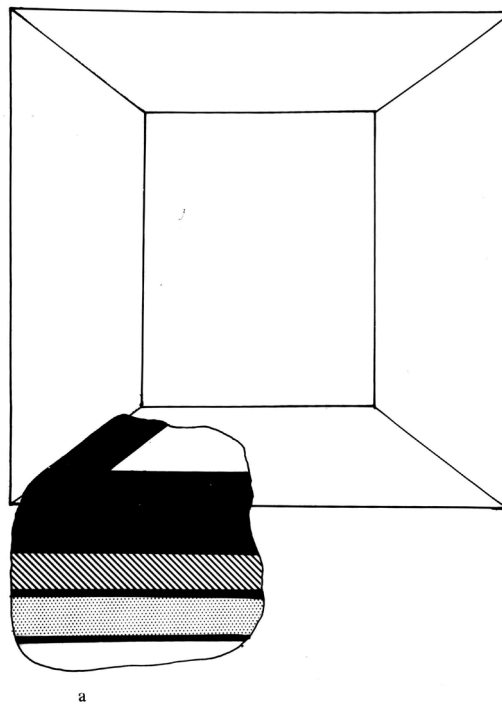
Wall plaster: unreconstructed schemes Scheme 2
